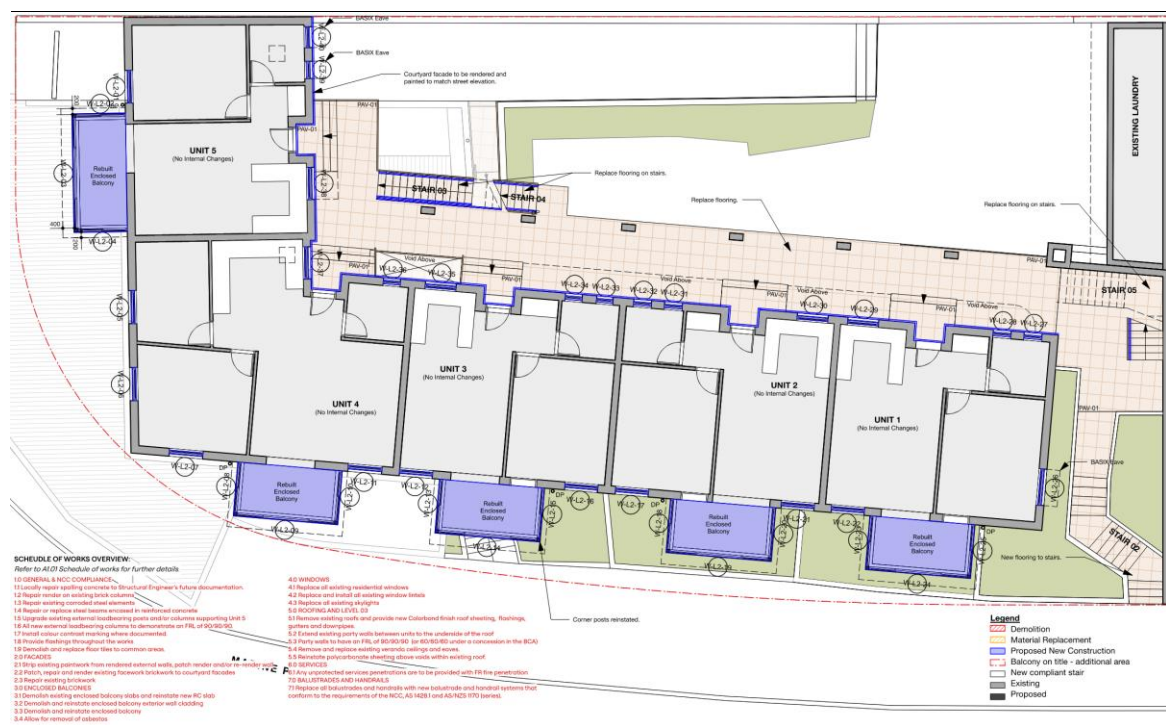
Proposed Level 02 Plan (Source: Hill Thalys – 05/12/2025)
